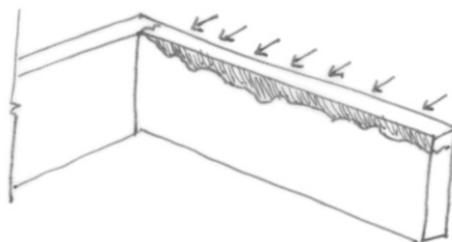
Horizontal cracks in the upper masonry area due to lateral forces
